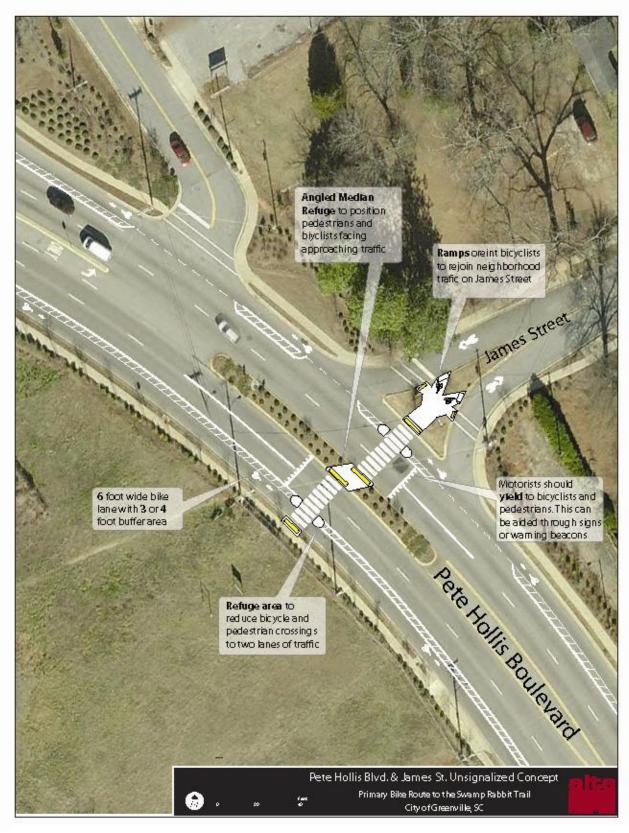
Intersection improvements at Pete Hollis Boulevard and James Street along a Primary Bike Route.
